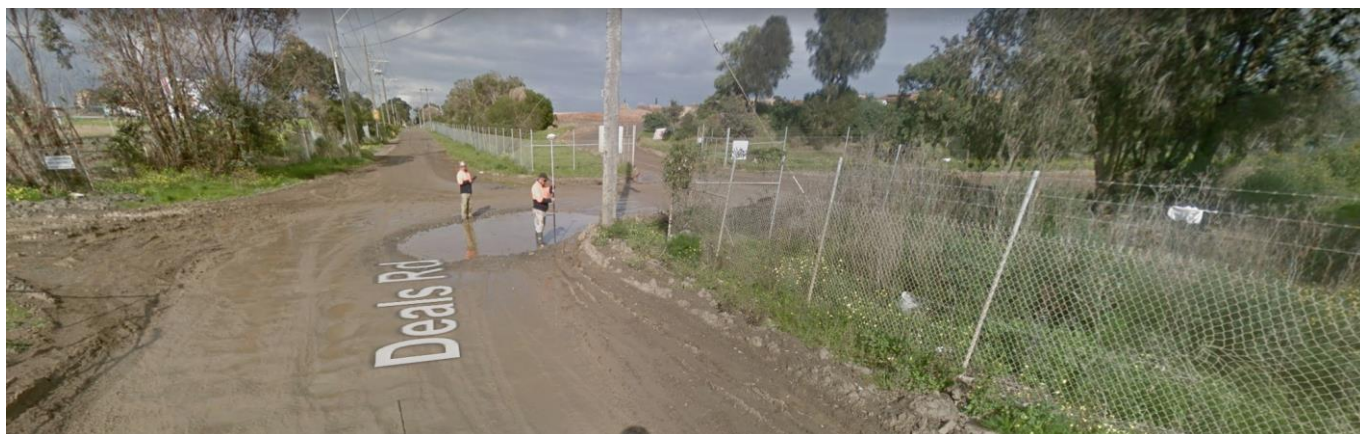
Deals Road and Fraser Road Intersection Stormwater Ponding (Source: Google Street View 2014)
